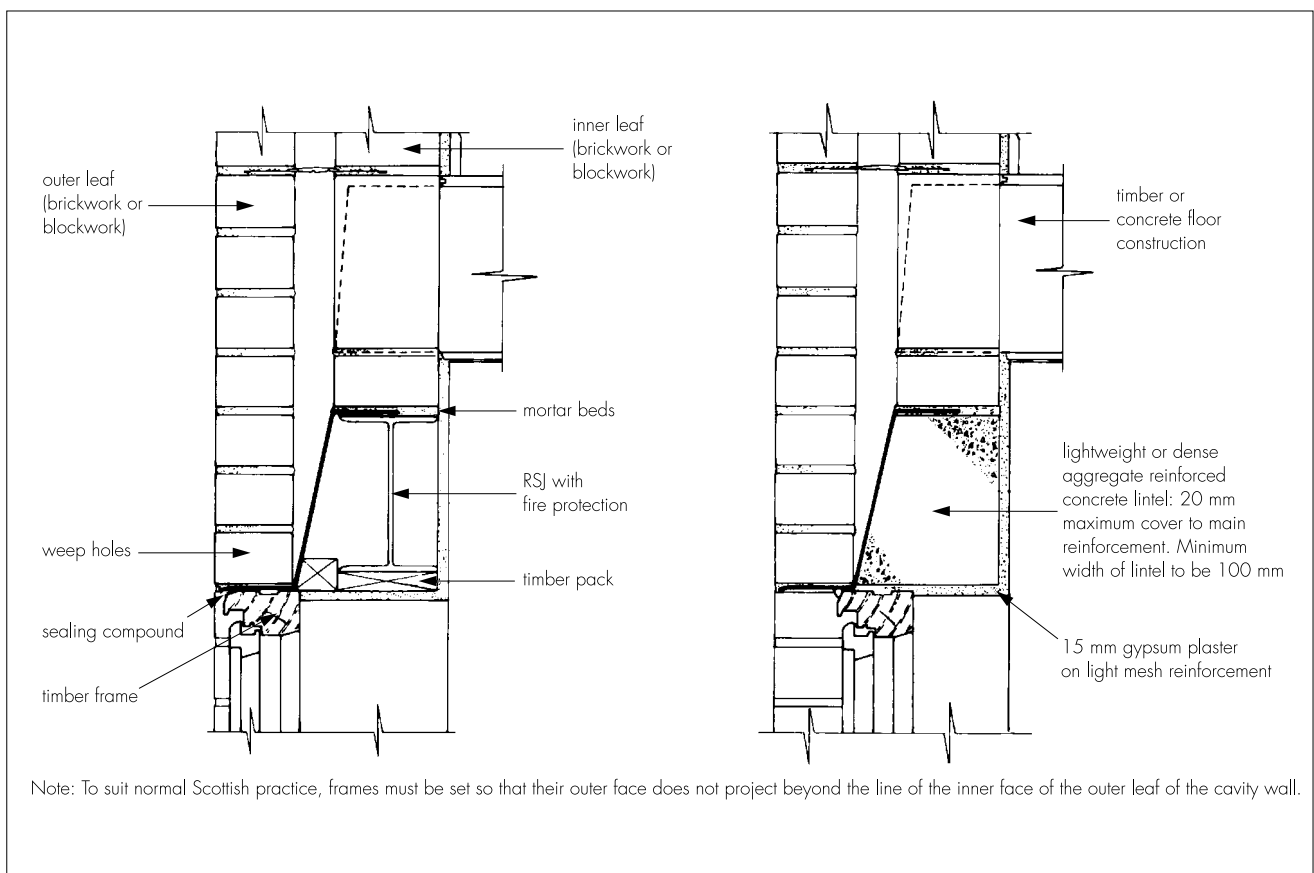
Typical installation details for lintels types CN3 and CN4\
